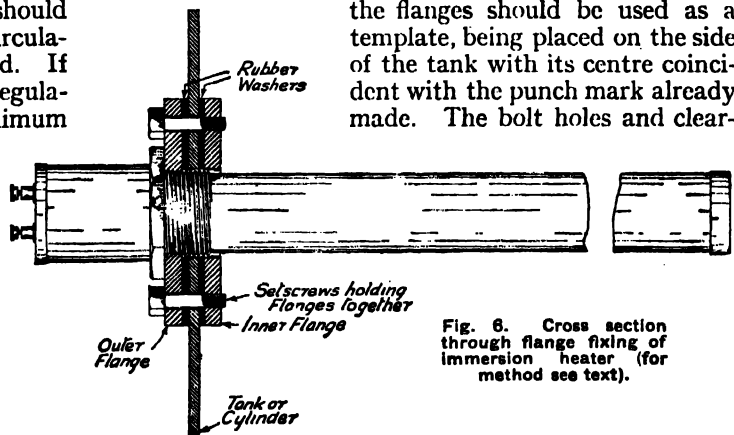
Cross section through flange fixing of immersion heater (for method see text).
